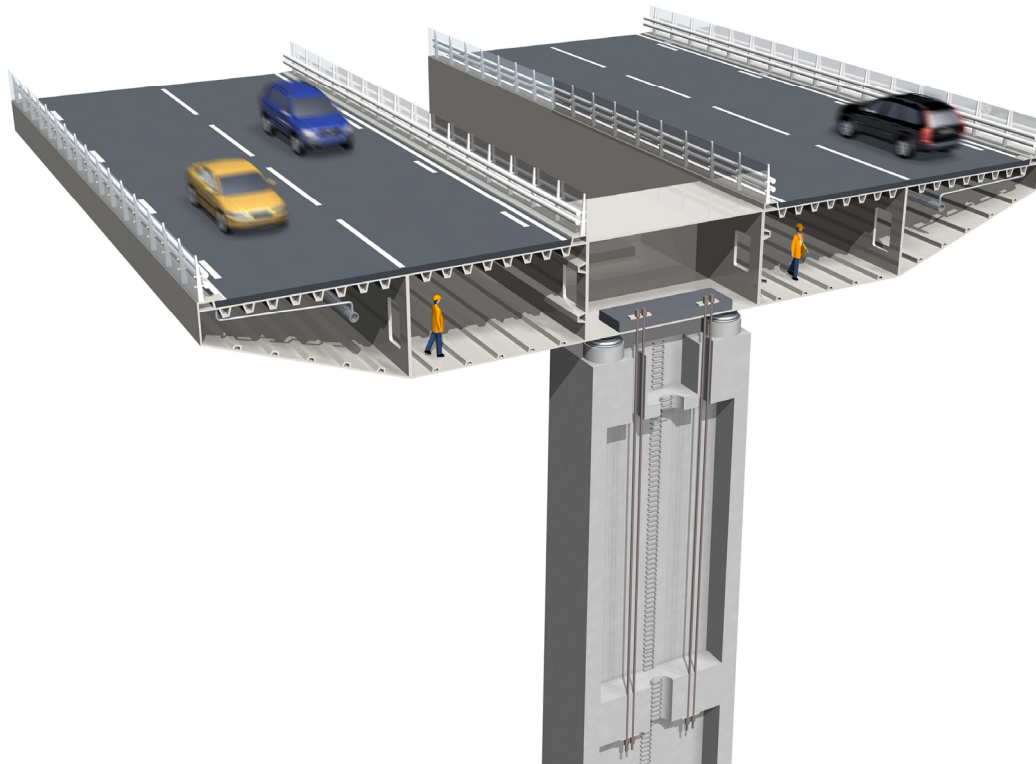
Cross section of the bridge decks with a transverse beam supported by a column. Figure from www.vv.se/svinesundsforbindelsen.
